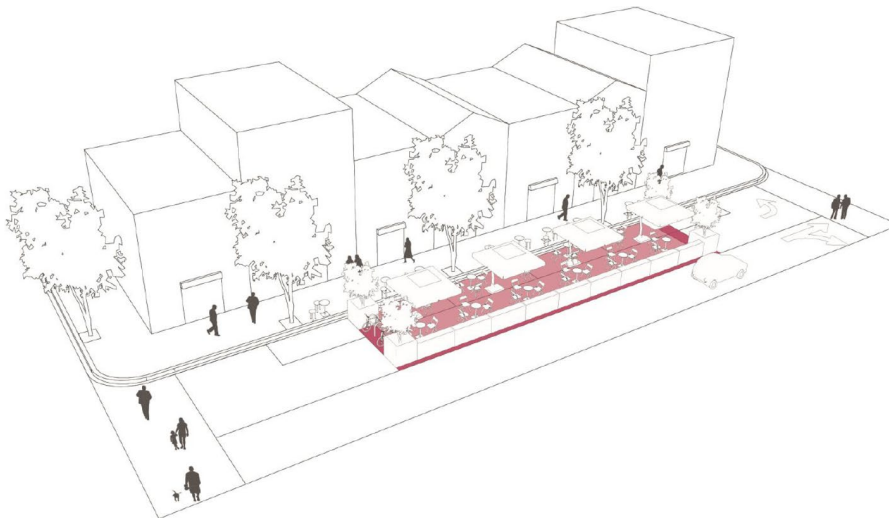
Example of barriers used for a parklet (associated traffic management not shown)
